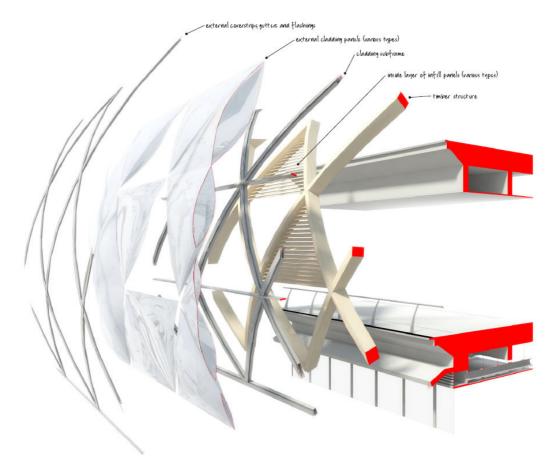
Showing the arrangement of the proposed principle cladding system of ETFE panels
